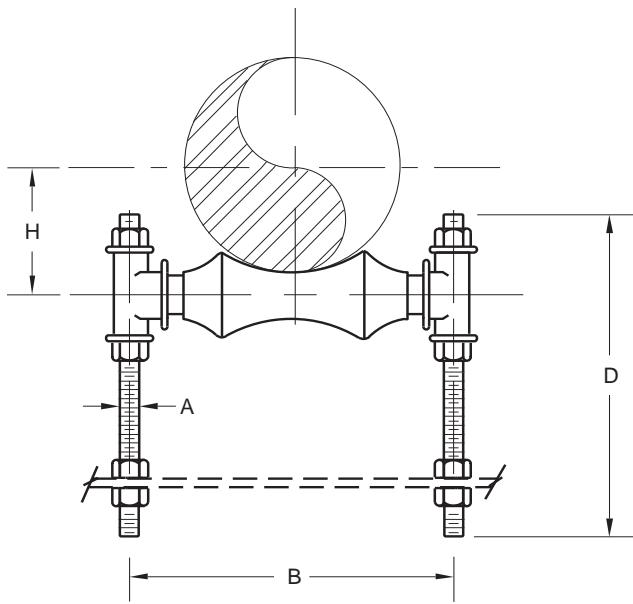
ADJUSTABLE ROLL SUPPORT
